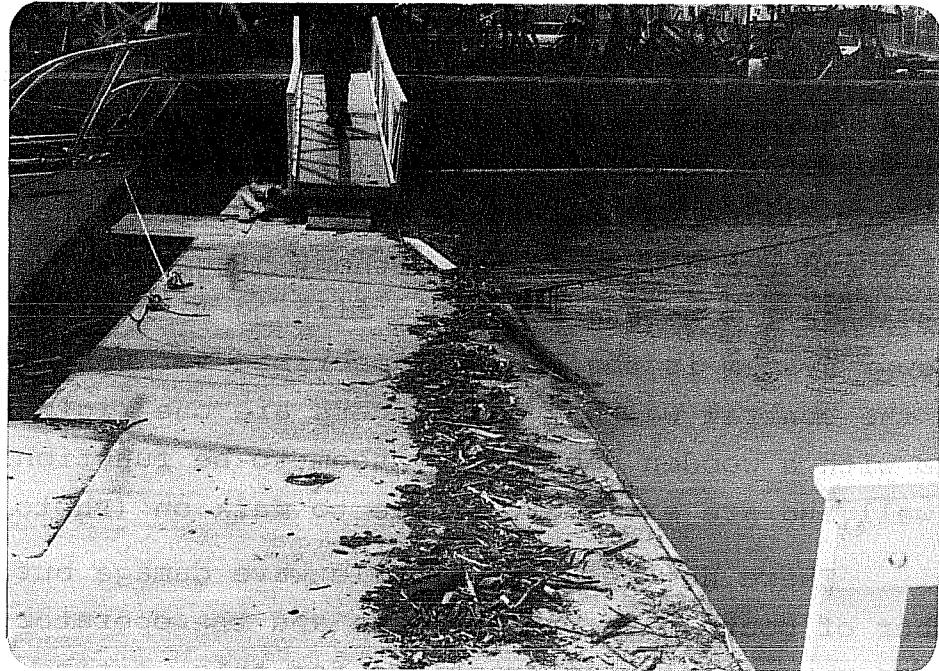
Hollow concrete walkways without foam flotation at Port Credit Harbour.
